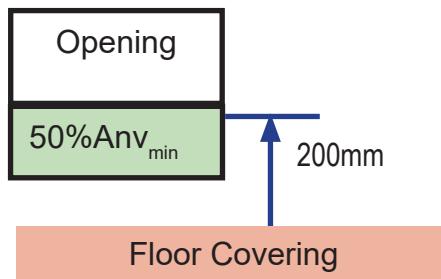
Minimum Natural Ventilation Opening Requirements Below 200mm
